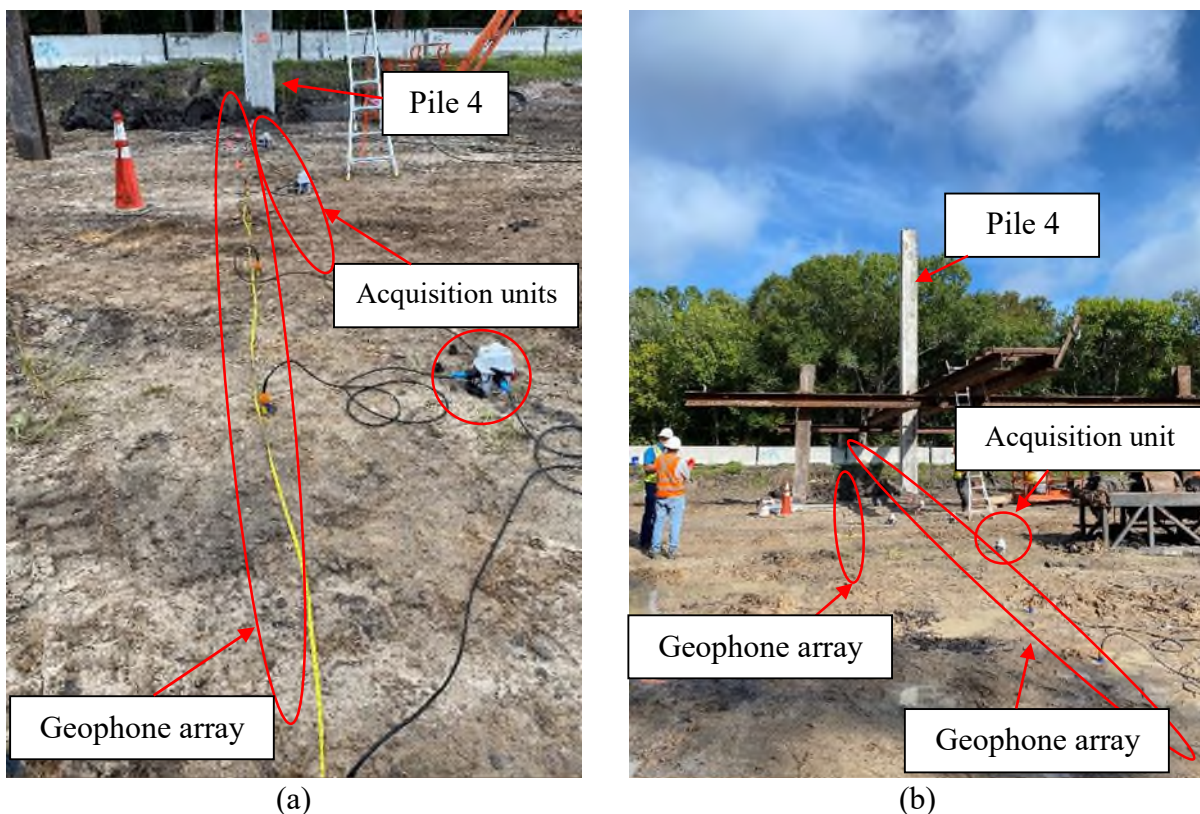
Field equipment installed at Site A3 during driving of pile 4: (a) first segment and (b) second segment.
